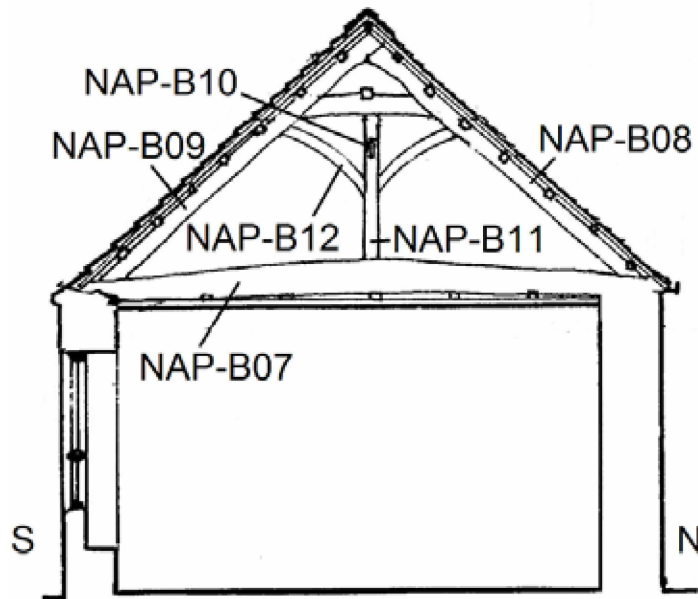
Hall, truss 3, showing the location of samples NAP-B07-12 (John Warren)
